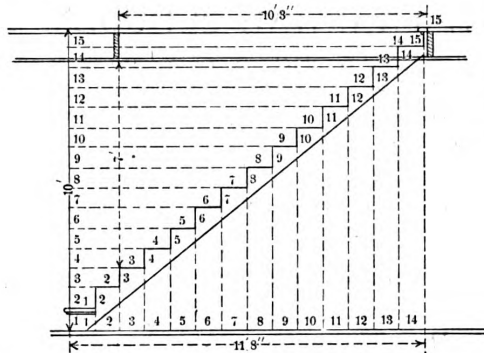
Diagram Showing Method of Drawing and Calculating for Stairs.—Scale, 3-16 Inch to the Foot.
